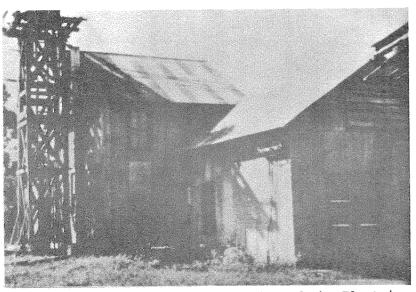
Illustration No. 94. Northeast view of the Electric Generator Building, as seen during the 1920's. View shows the corrugated metal siding and roof construction and represents the first usage of this type of construction at the Settlement.
